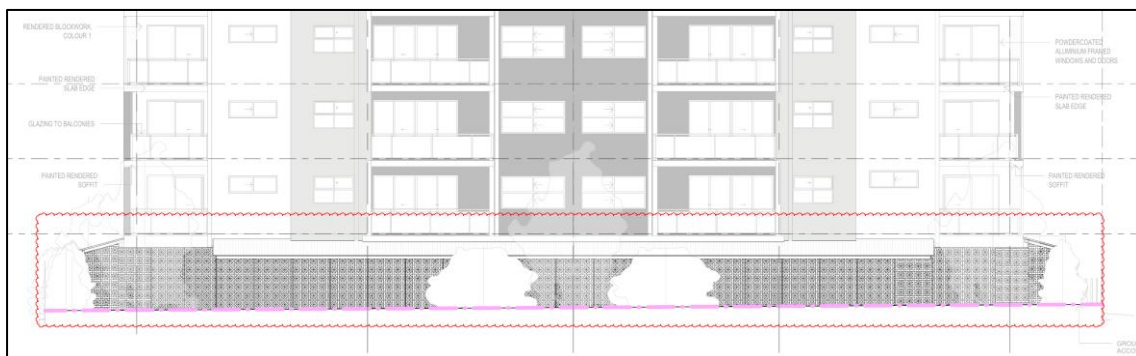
Southern Elevation – Extract (Source: ThinkTank Architects)
